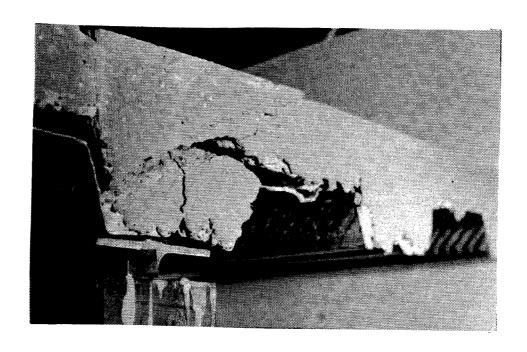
Shear Failure Plane at End of Slab in Stub Specimen III (Partial End-Plate Stiffeners)
